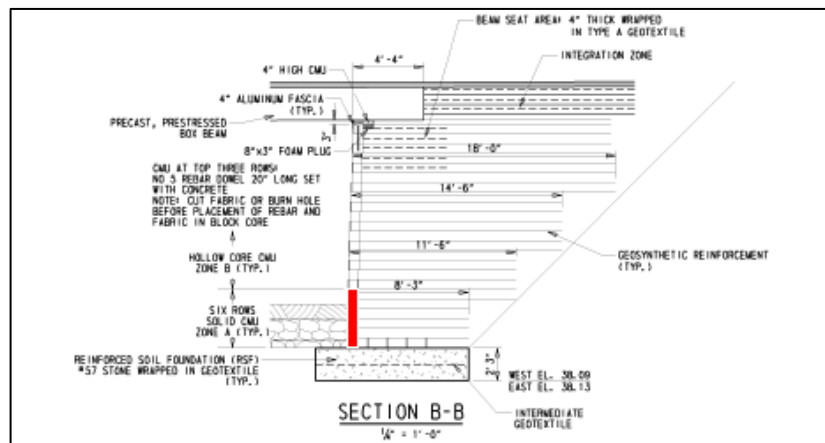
Design drawings of the BR 3-140 Bridge (Walls 2014)
